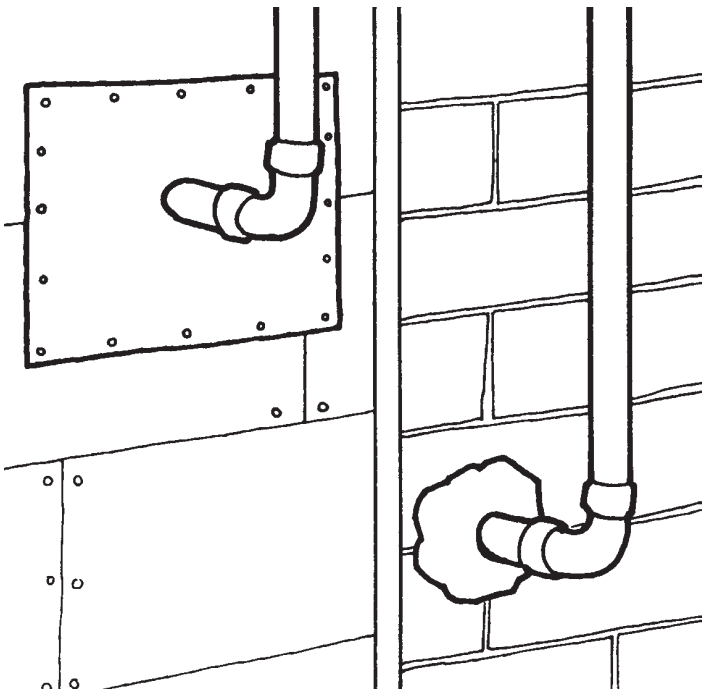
Rodentproofing openings around pipes with sheetmetal (left) and concrete (right).
